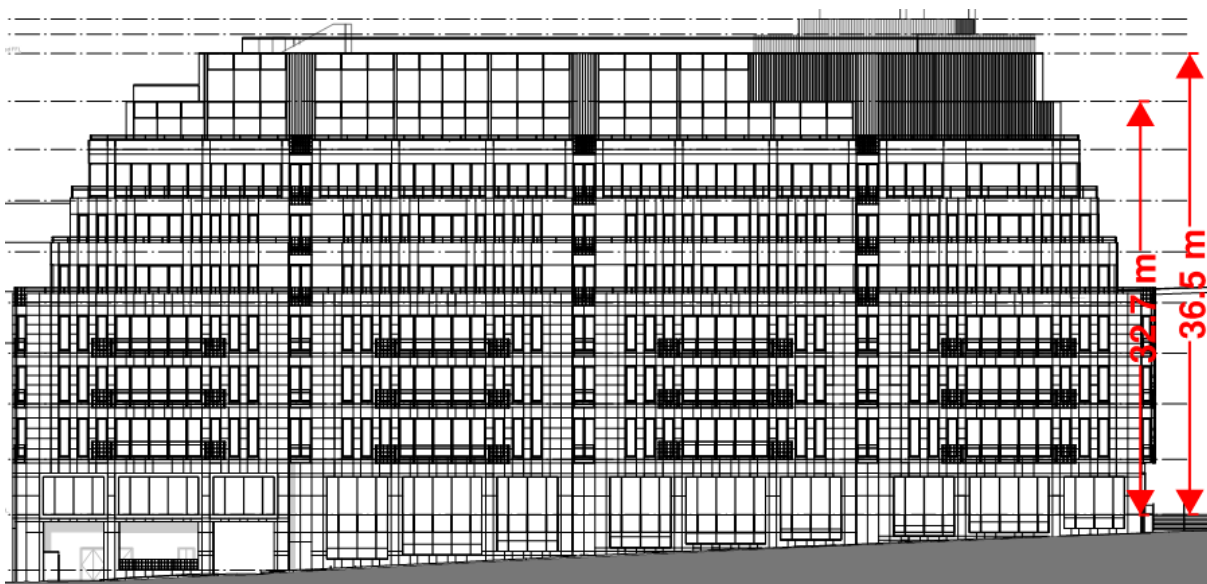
East elevation showing the heights of the top occupied eighth and roof terrace floors for the South building
